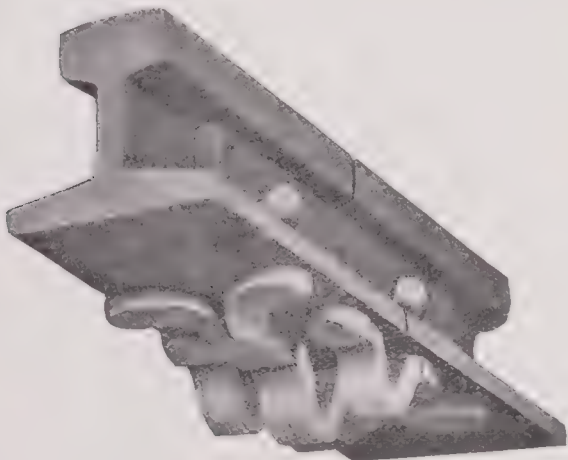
PROTECTED TYPE OF BOND ON LONDON UNDERGROUND ELECTRIC RAILWAYS.
